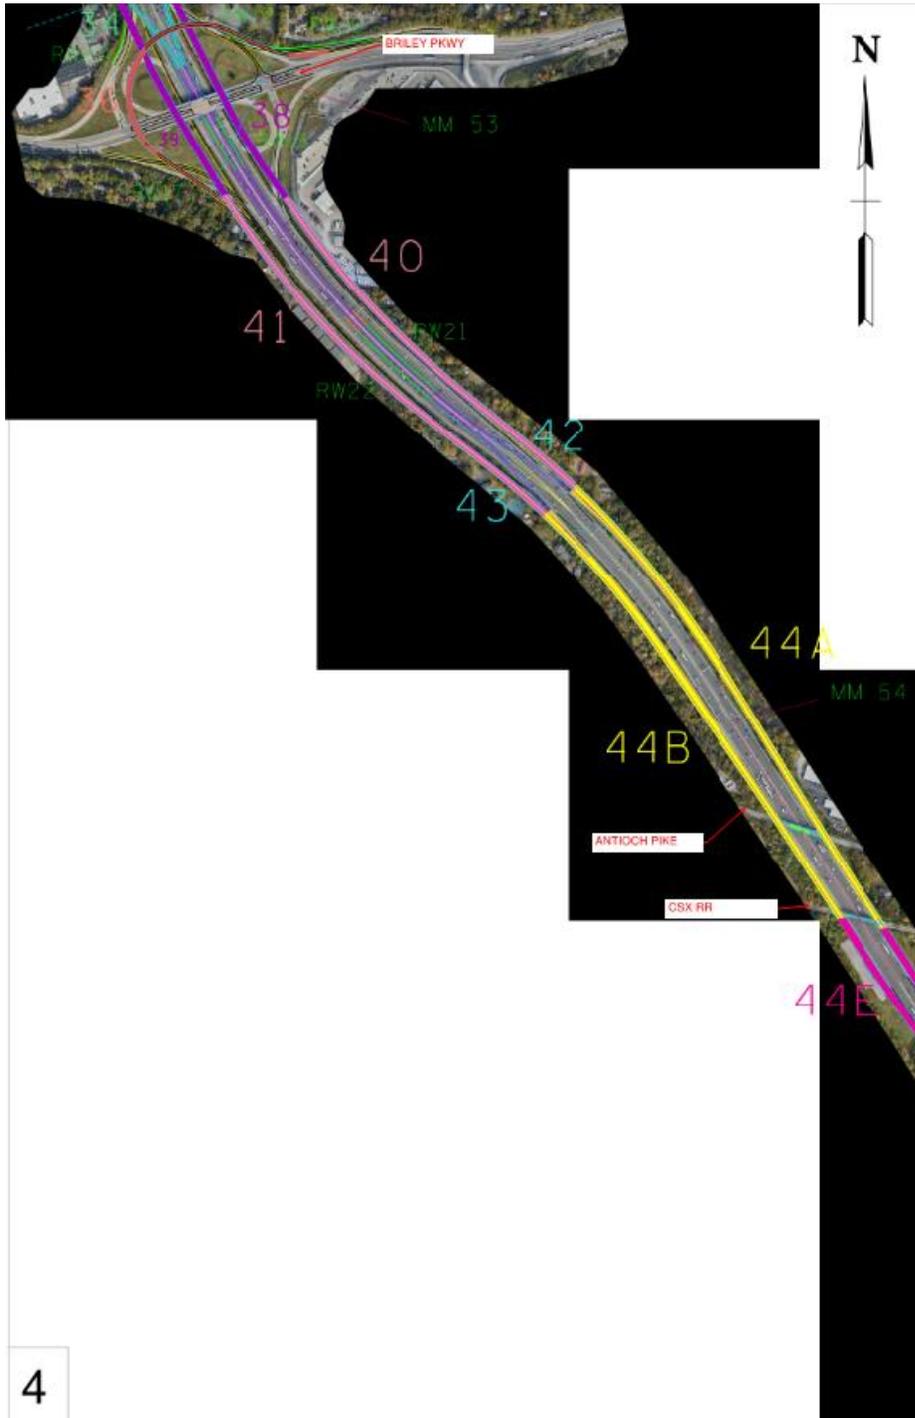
Alternative 1, Bridge and Retaining Wall Locations, Murfreesboro Pike to Glenrose Ave
